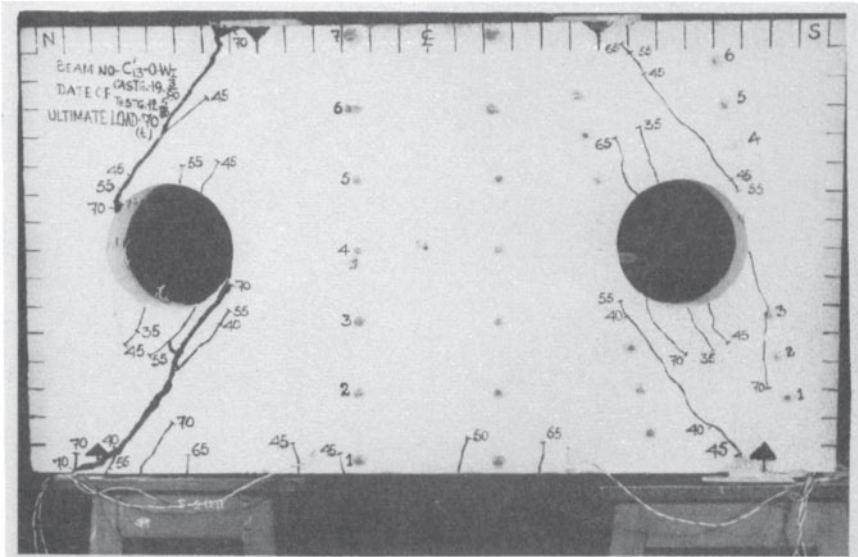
Crack patterns at failure of a typical deep beam with circular web openings (under two-point loading).
